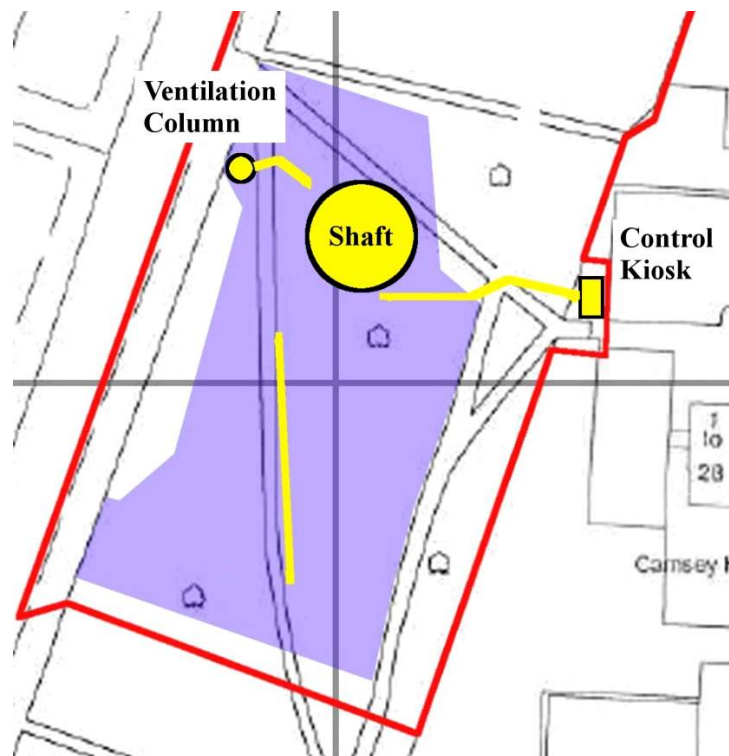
Sketch location plan of the main drive shaft, control kiosk, ventilation column and associated trenches in Area B.
